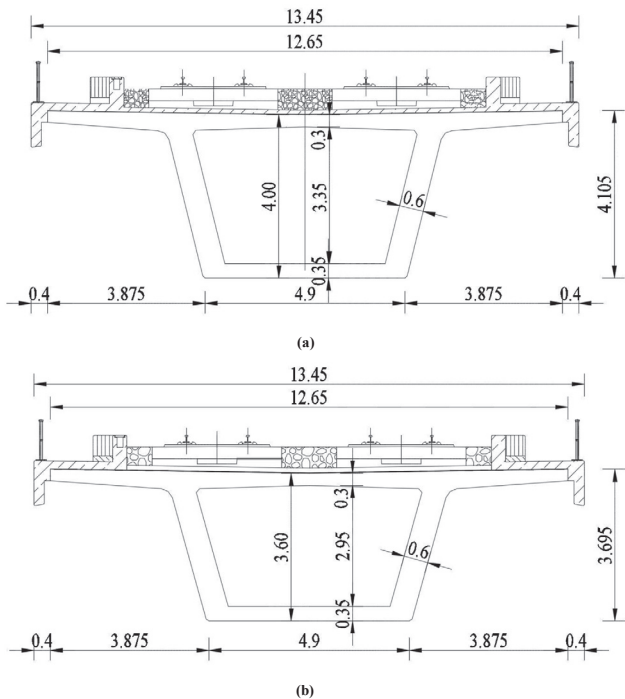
Cross sections of two 44-m-span bridges [9] (a) Cross section of the 44-m-span simply supported bridge and (b) Cross section of the 44-m-span continuous bridge.
